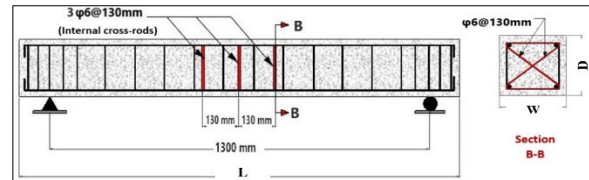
Beam Specifications and Reinforcement (B-3CR).
